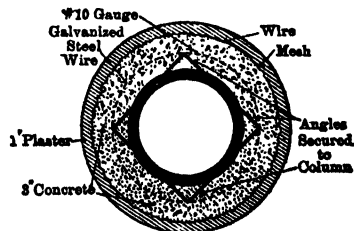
Fireproofing of Cast-iron Column with Concrete and Plaster
